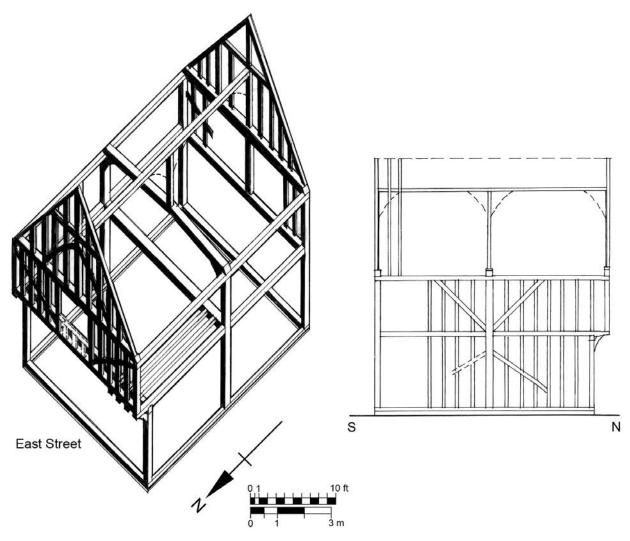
(left) Isometric view and (right) side elevation of 37 East Street (corpus no. 21)
